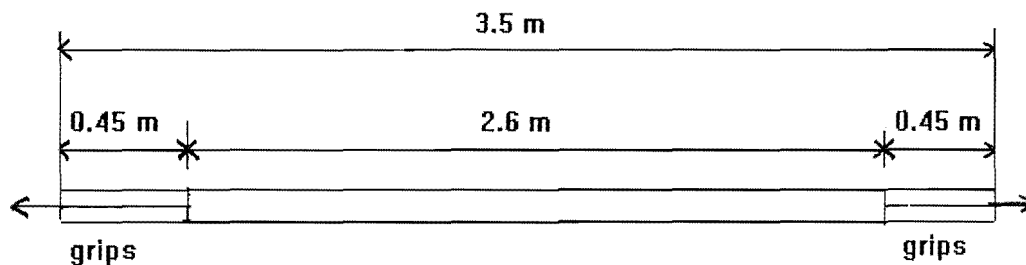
Geometry of in-grade tensile test specimens.
